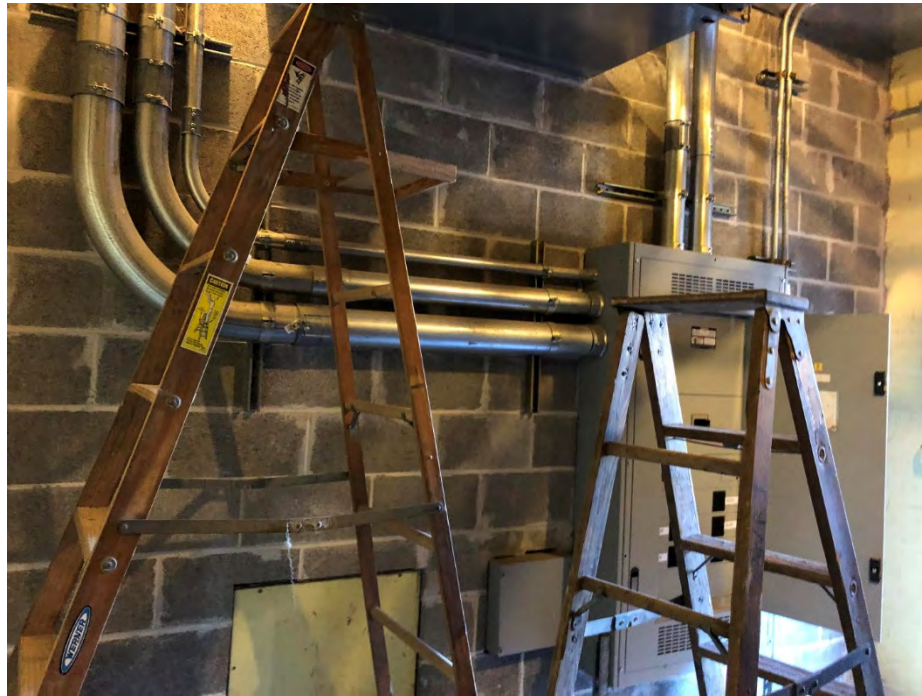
1000A Distribution Panelboard DP-1 located in Switchgear Room on Lower Level in Building 2
